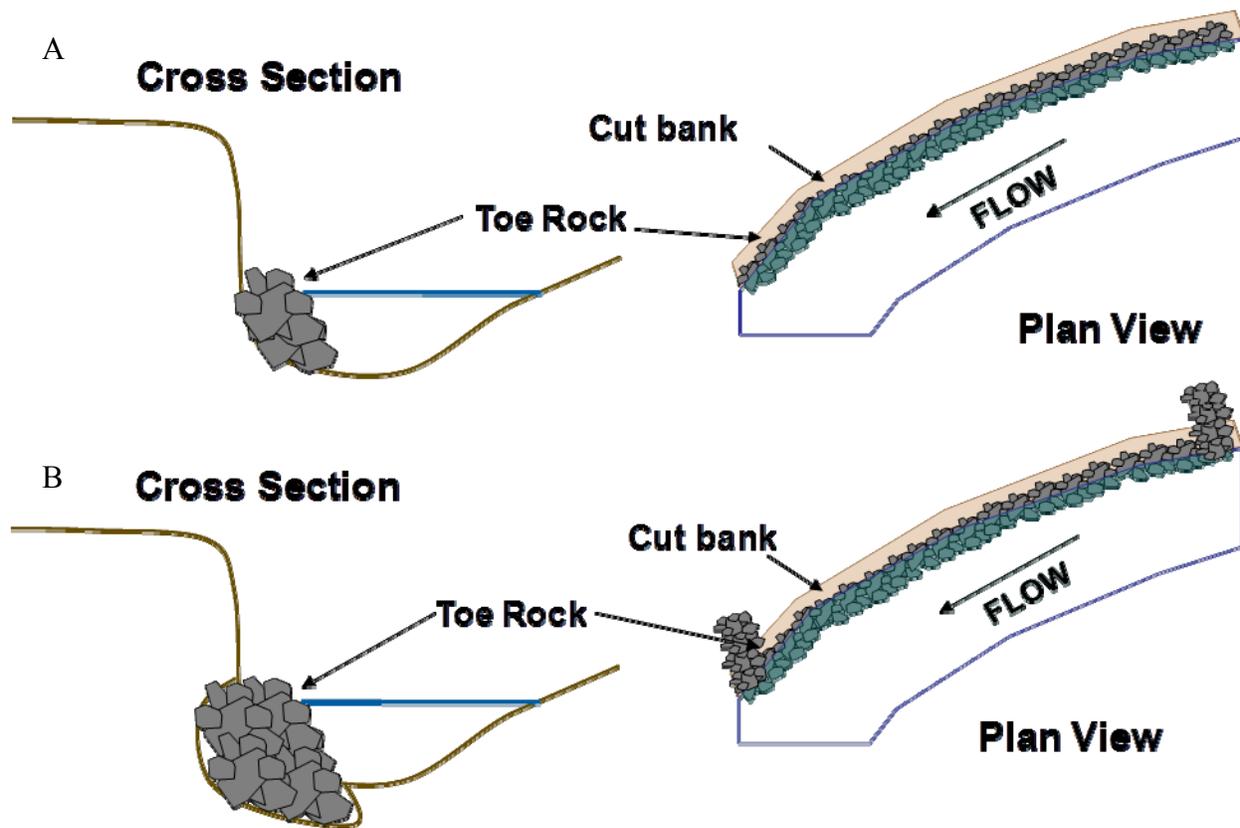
(A) Cross section and plan view of a generic experimental farm rock toe project. (B) Cross section and plan view of a generic traditional rip rap blanket project.
